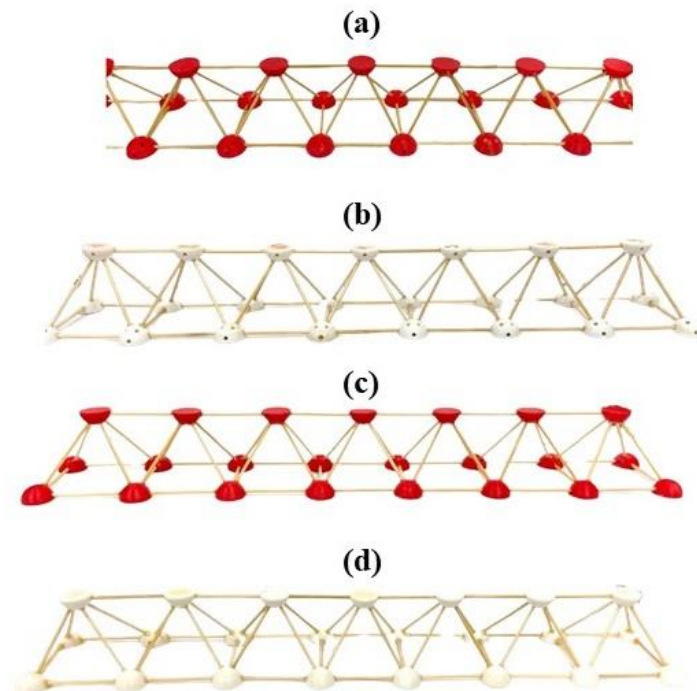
(a) PLA beam with open joints; (b) PETG beam with open joints; (c) PLA beam with closed joints; (d) PETG beam with closed joints.
